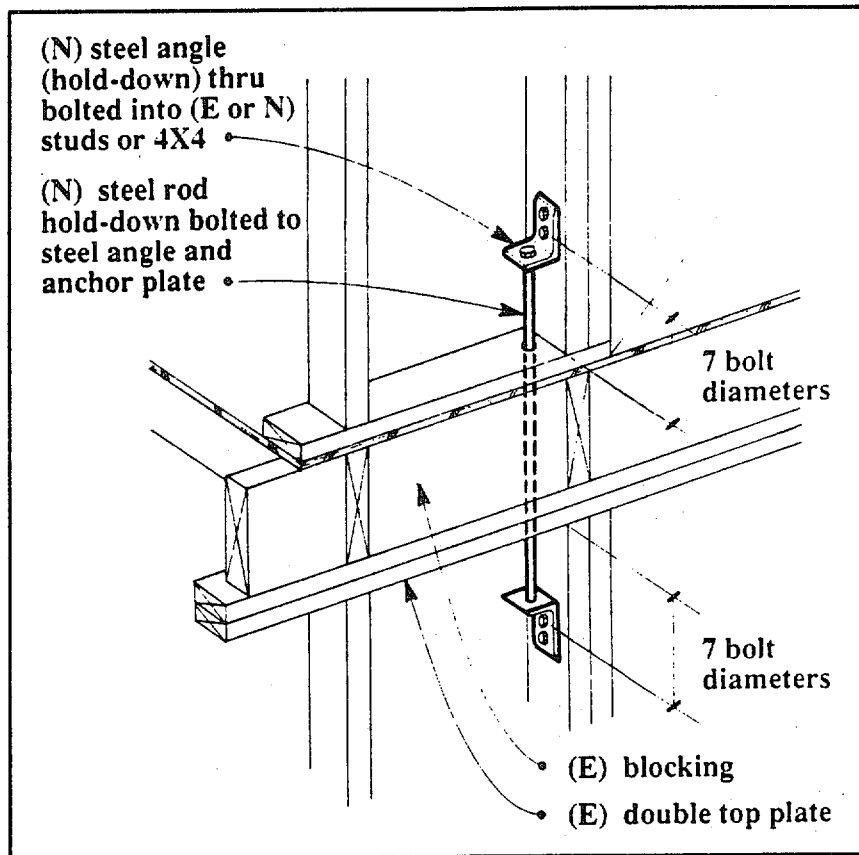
Strengthening the connection between shear walls using a hold-down.
